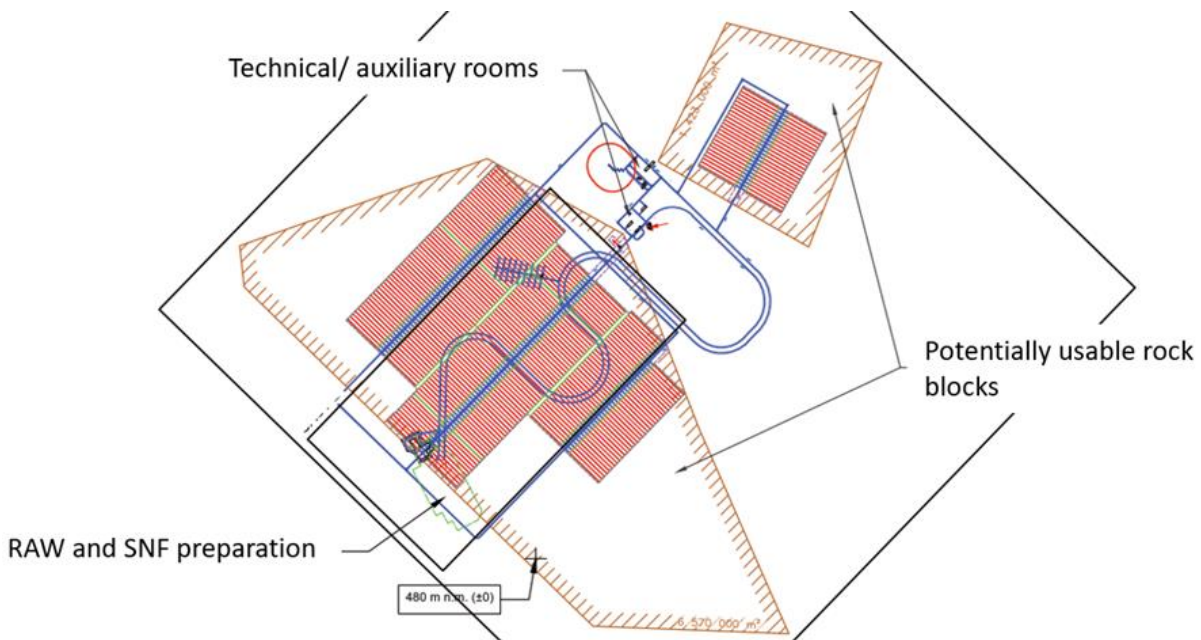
Horizontal disposal, prevailing conventional drill and blast method (D4 - HD, C) (Spinka et al. 2018). Red lines = TBM tunnels, blue lines = D&B tunnels.
